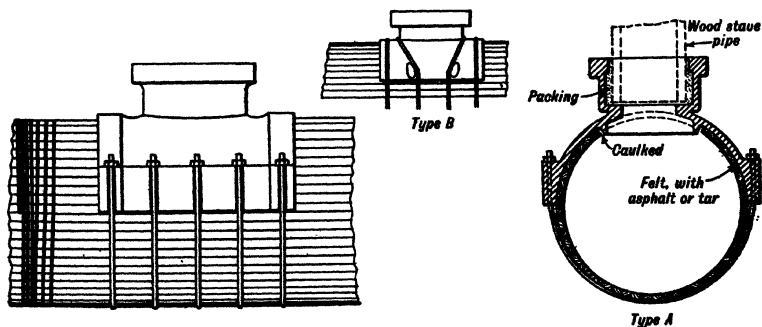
Typical Branch Connection for Wood-stave Pipe.
